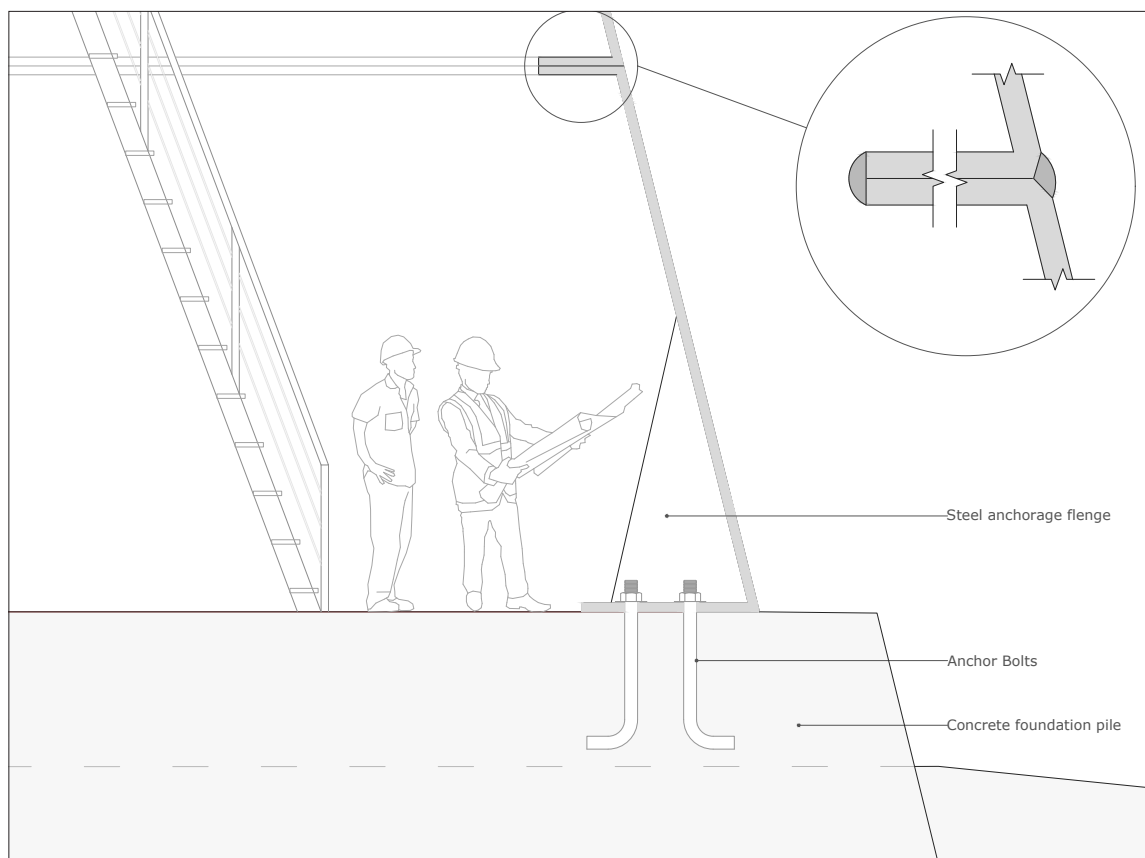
Anchorage of the pylon to the concrete pile foundation
